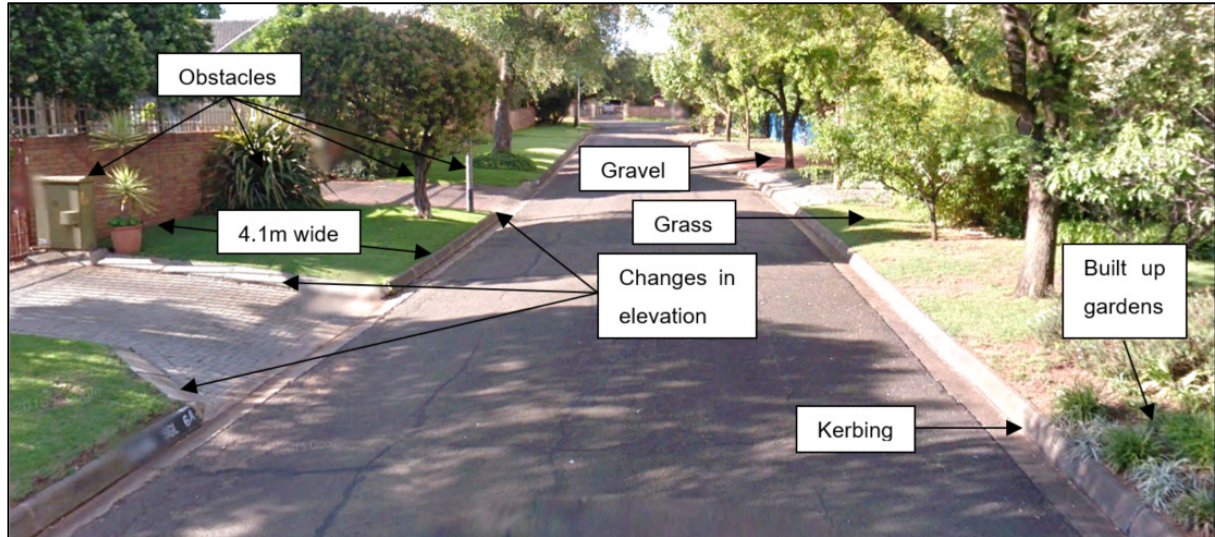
Clegg Crescent: Typical sidewalk and verge elements in the study area (Source: Author).
